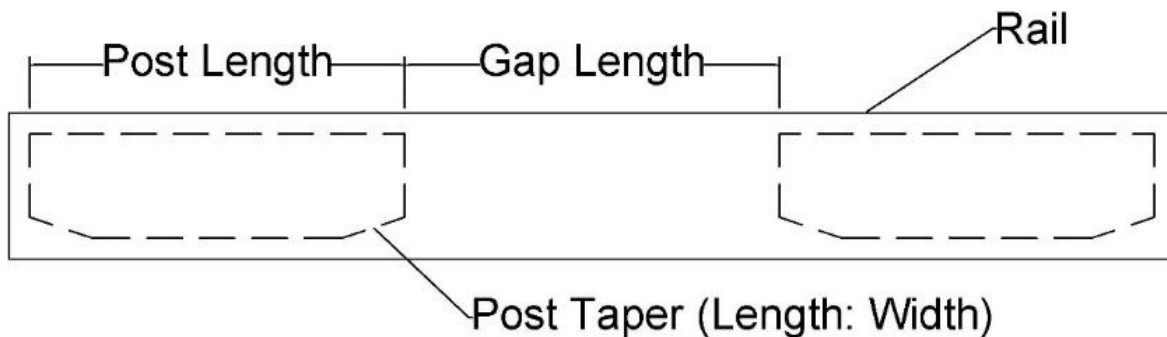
Open Concrete Bridge Rail General Dimensions Elevation
